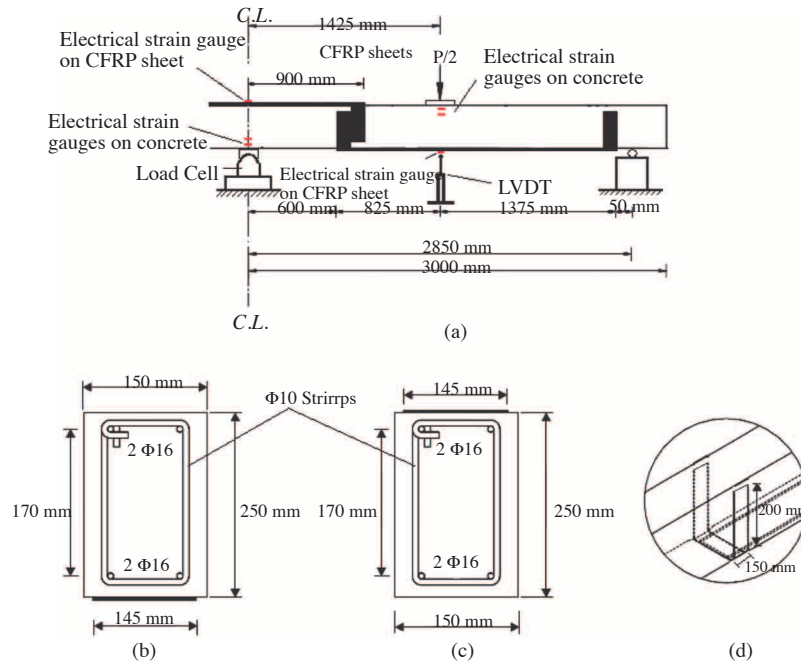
Test set-up and monitoring devices. (a) Longitudinal profile of beam, (b) typical cross section of beam in sagging region, (c) typical cross section of beam in hogging region, and (d) end anchorage system.
